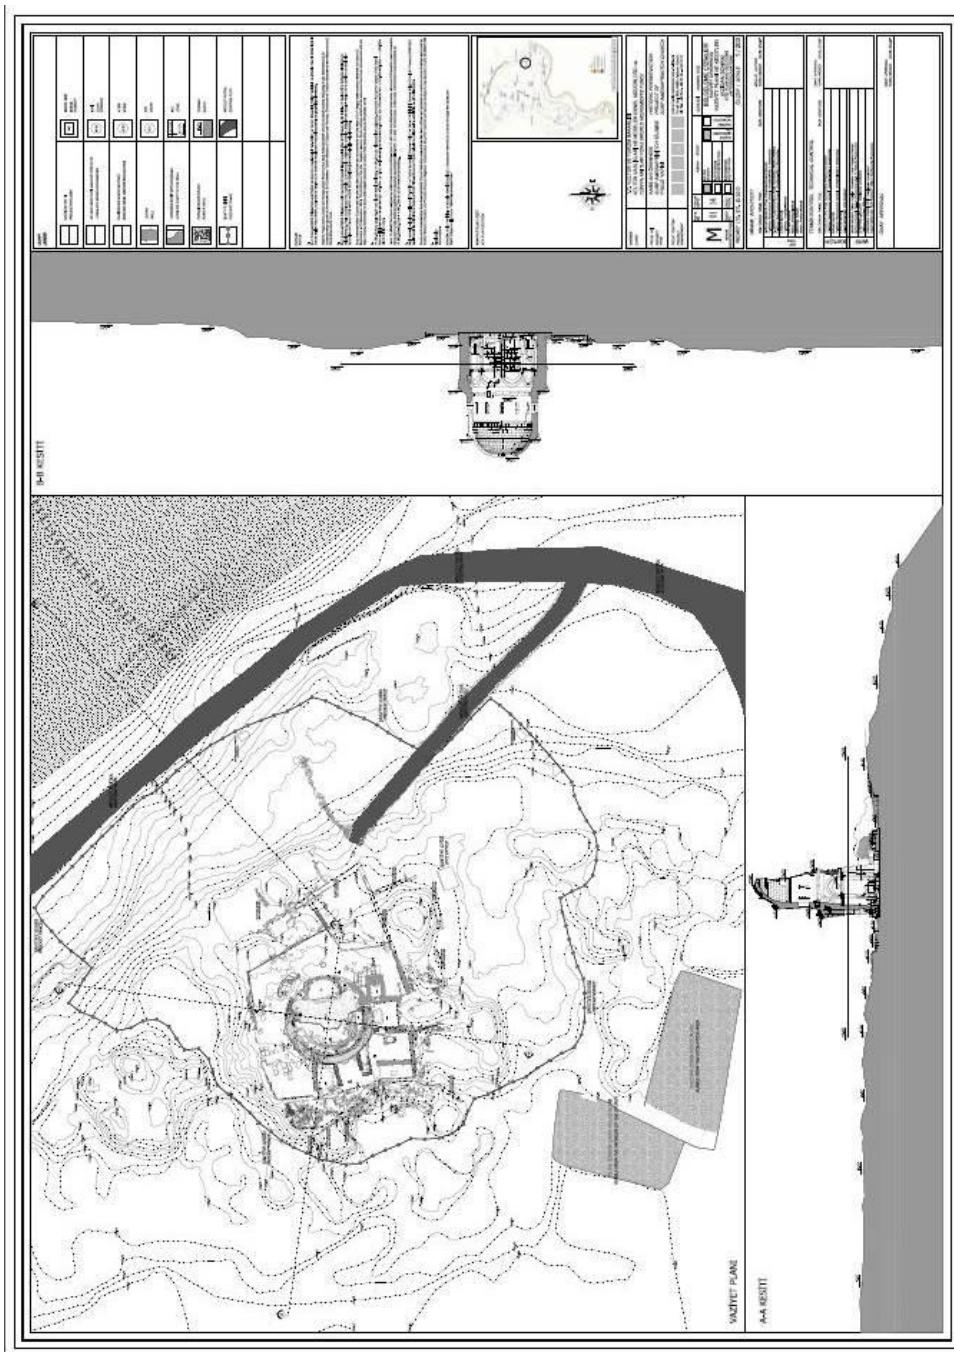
Site Plan, Historic Preservation Project of Surb Amena P'rkich Church, Promet Proje Ltd.Şti. 2012
